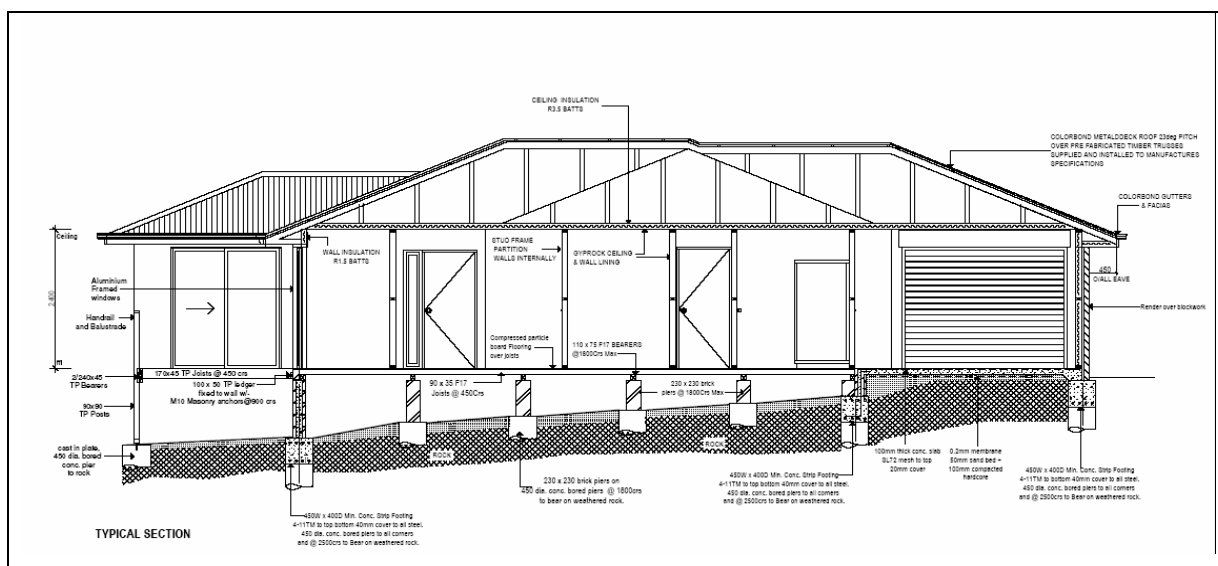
Section drawing of the timber floored test house (Source: Wilson Homes)
